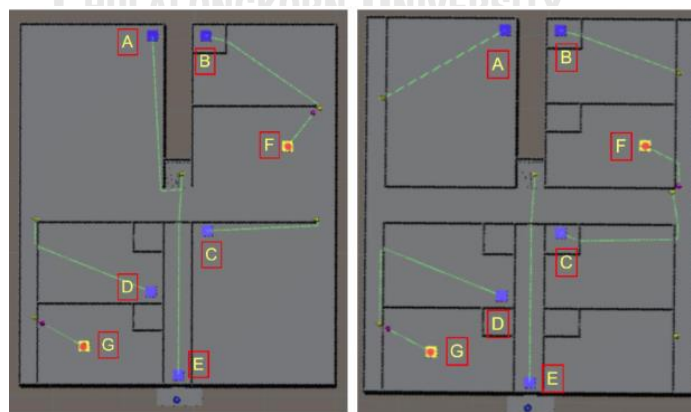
The generated fire extinguisher installation plan (Tongthong et al., 2023)
